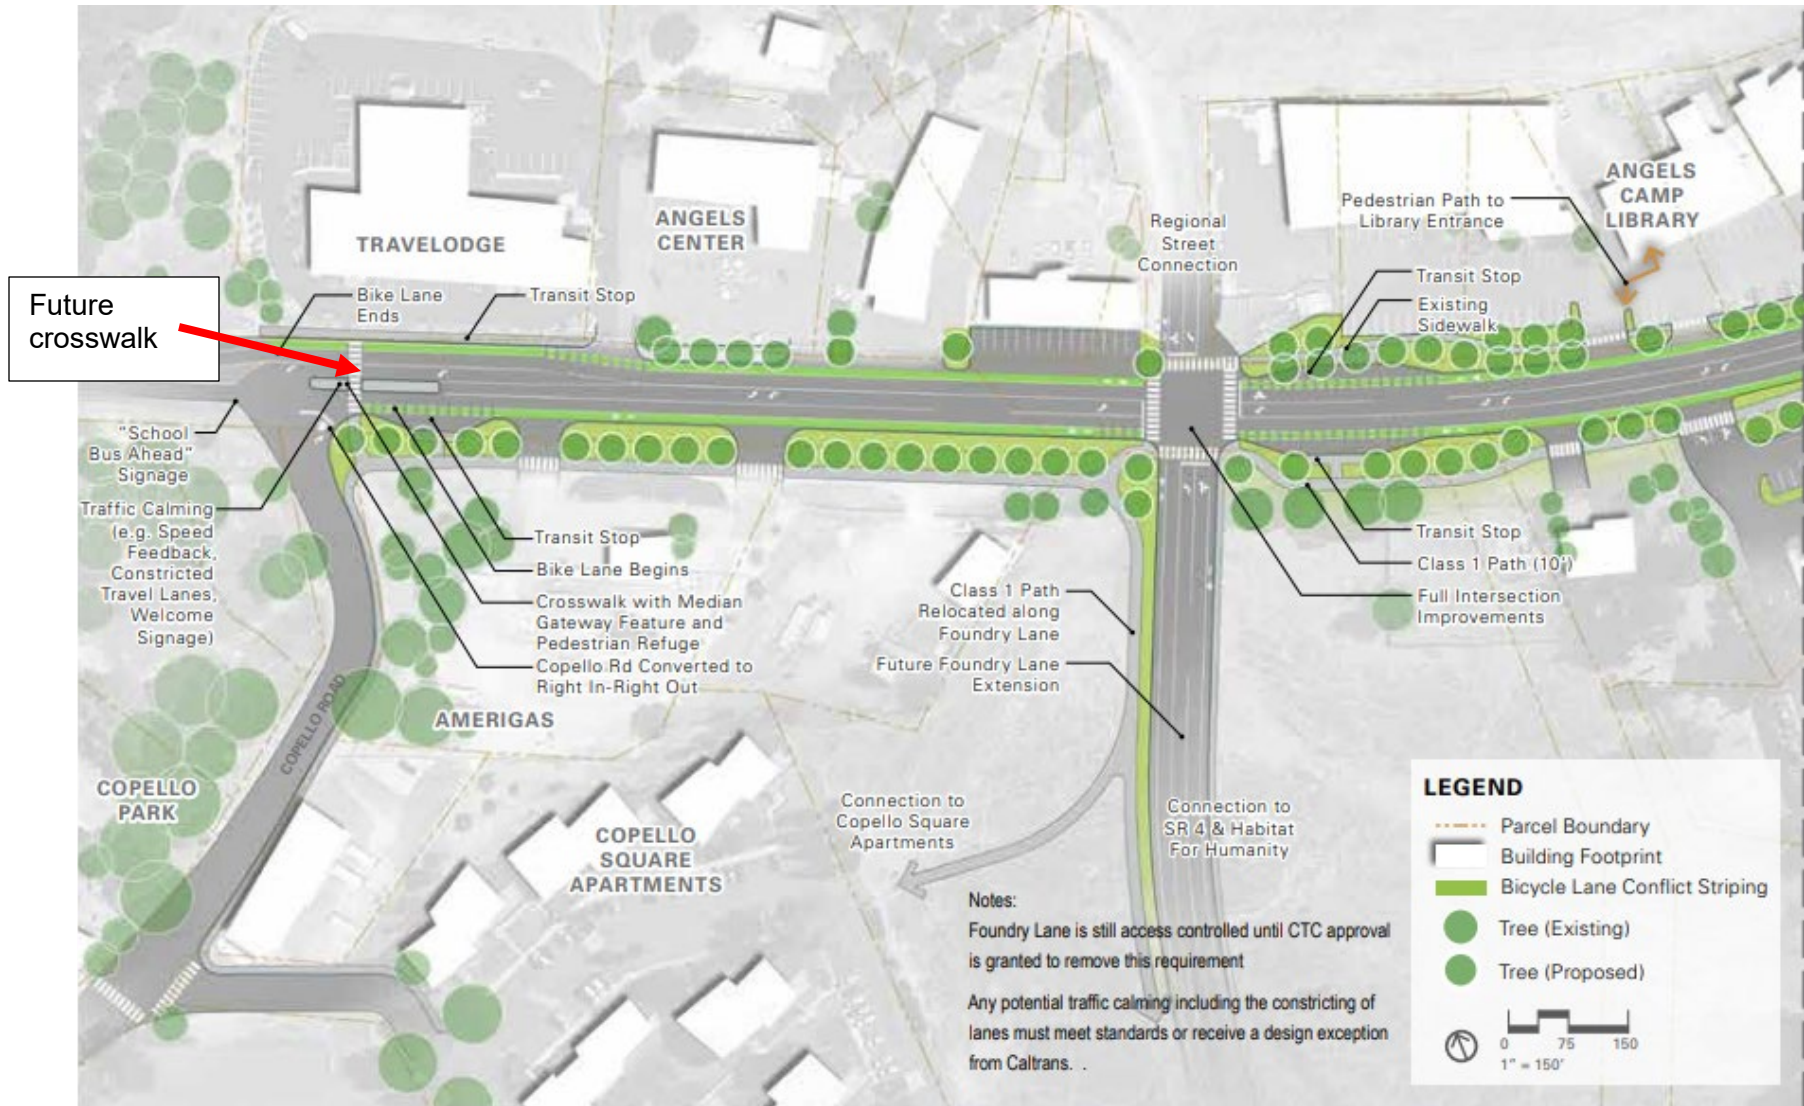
Proposed Improvements at Copello Road and Transit Stop (Looking North)
